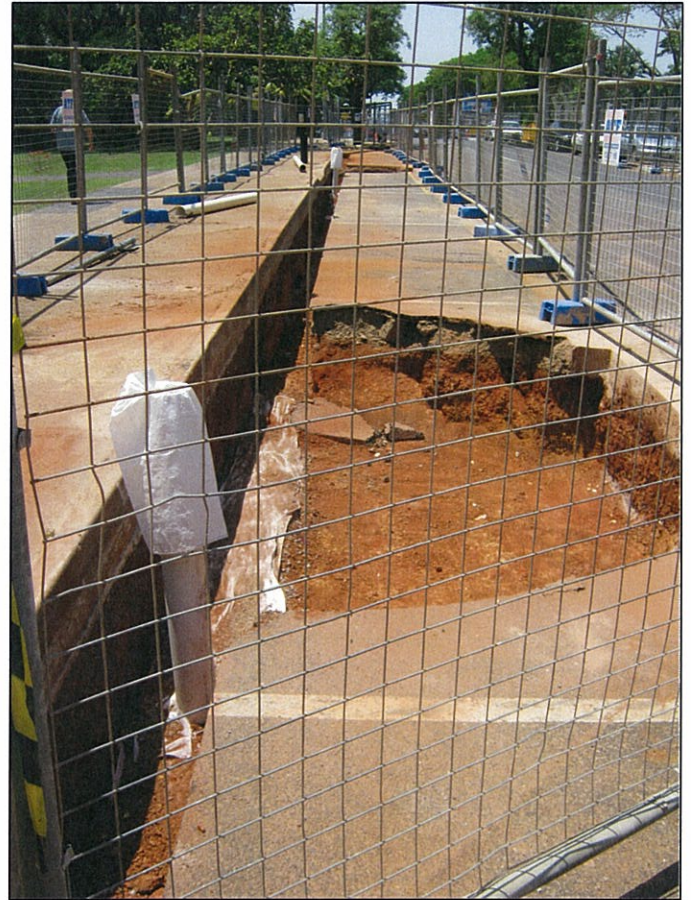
Tree pit and subsoil drainage on the Eastern side of Smith Street.
